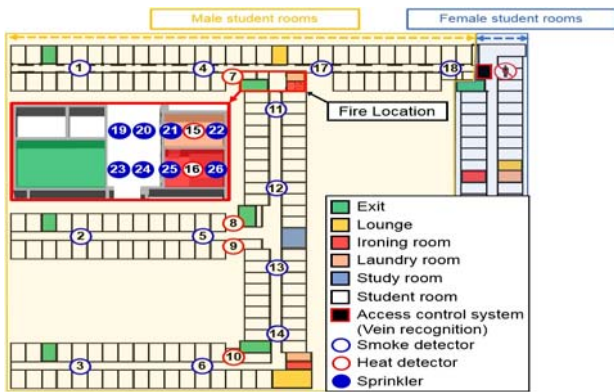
Locations of fire detectors and sprinkler on 4th floor at college dormitory
